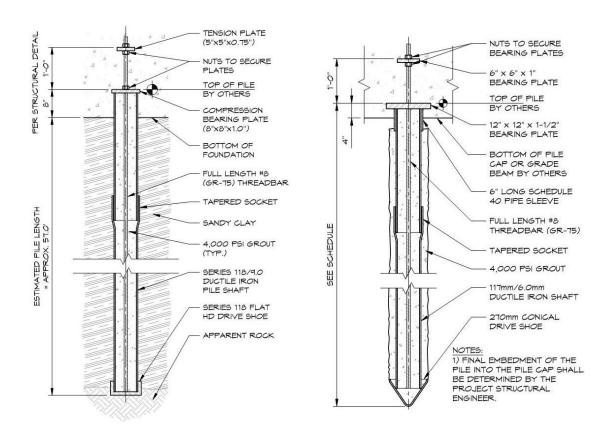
Examples of Ductile Iron Pile Tension Details – a) Non-grouted (Exterior) and b) Grouted (Exterior)
